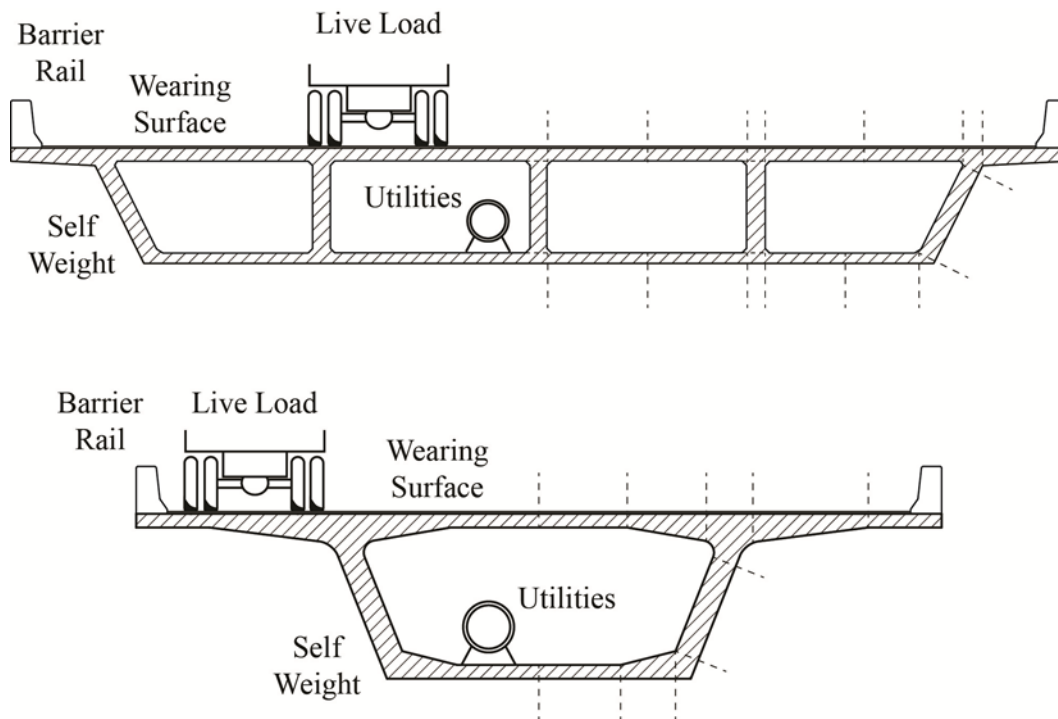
Concrete Box Girder Cross Sections and Loads
